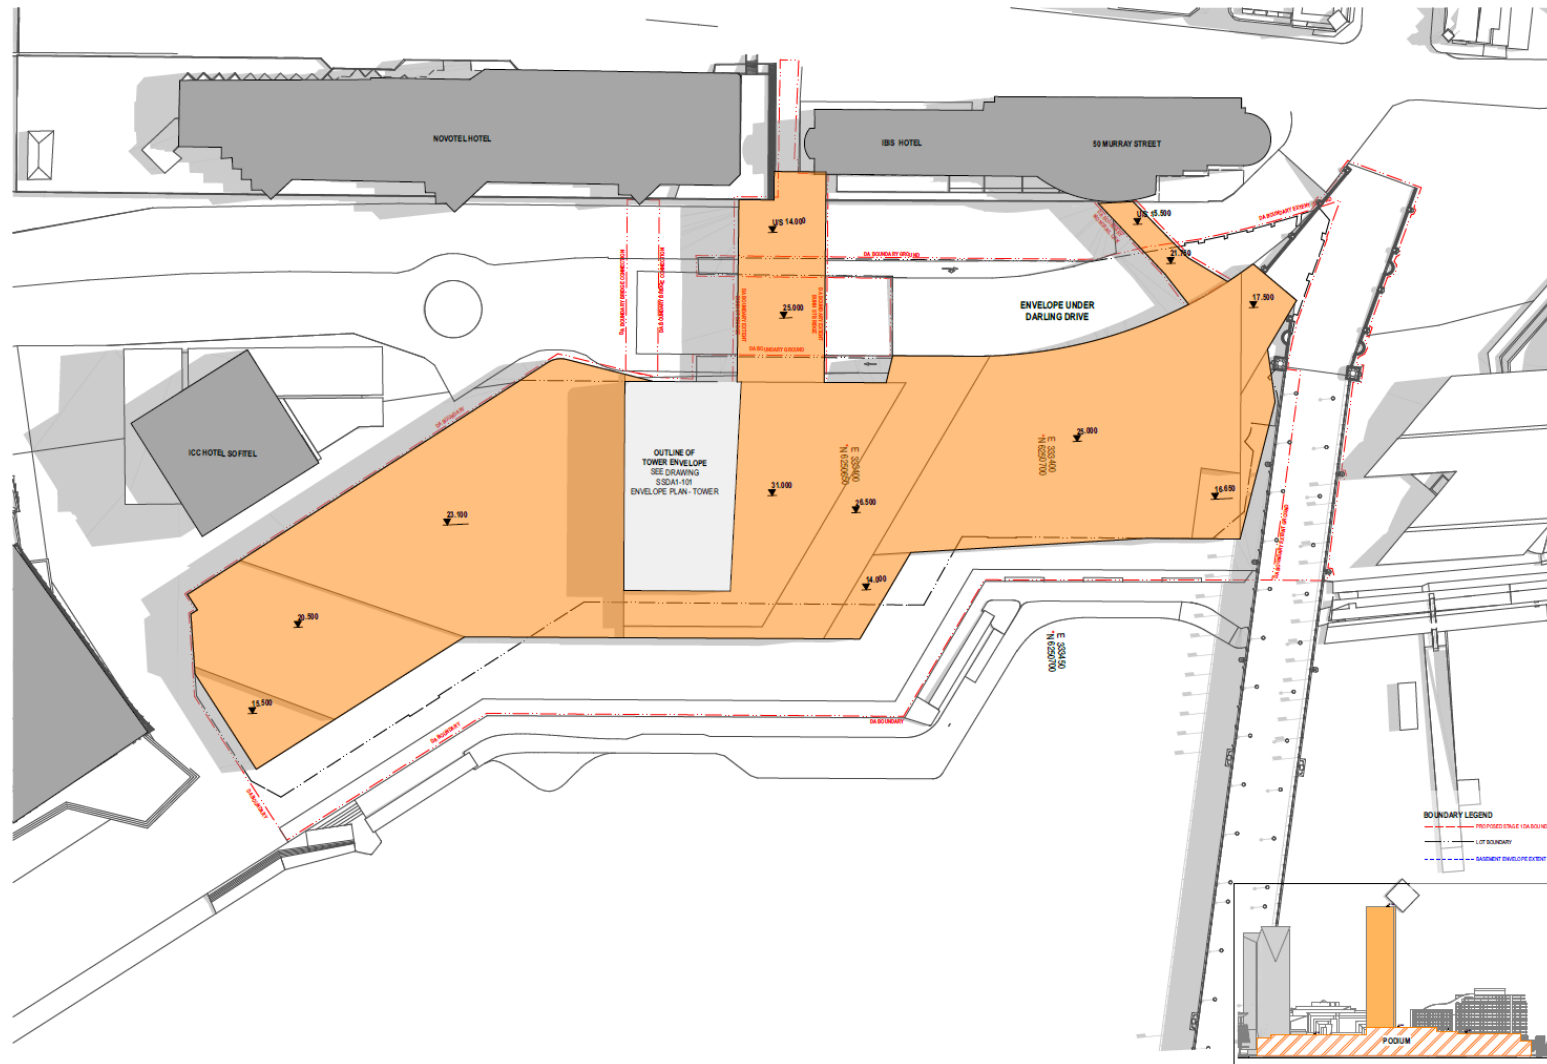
Envelope Plan – Podium (Source: FJMT, 2020)
